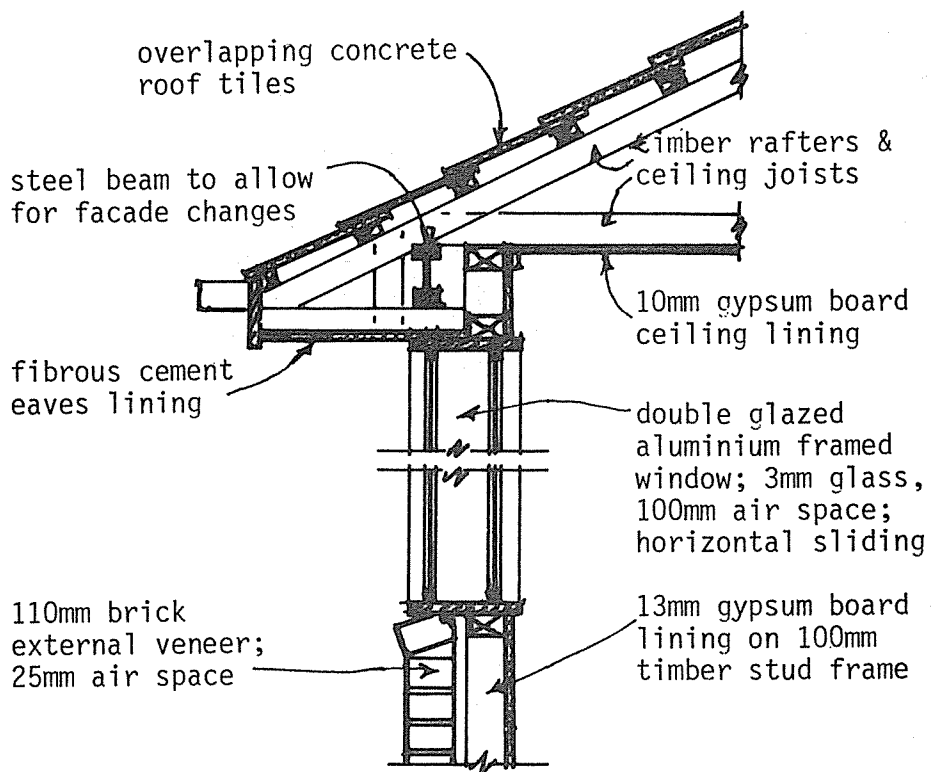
DOUBLE GLAZED WINDOWS IN BRICK VENEER FACADE
